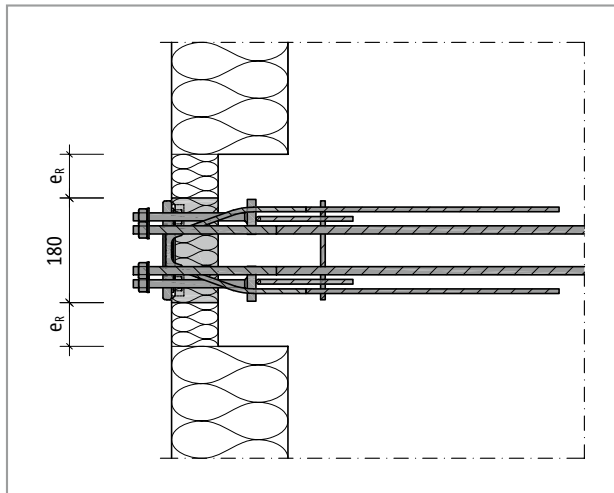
Schöck Isokorb® T type SK: Edge distances
